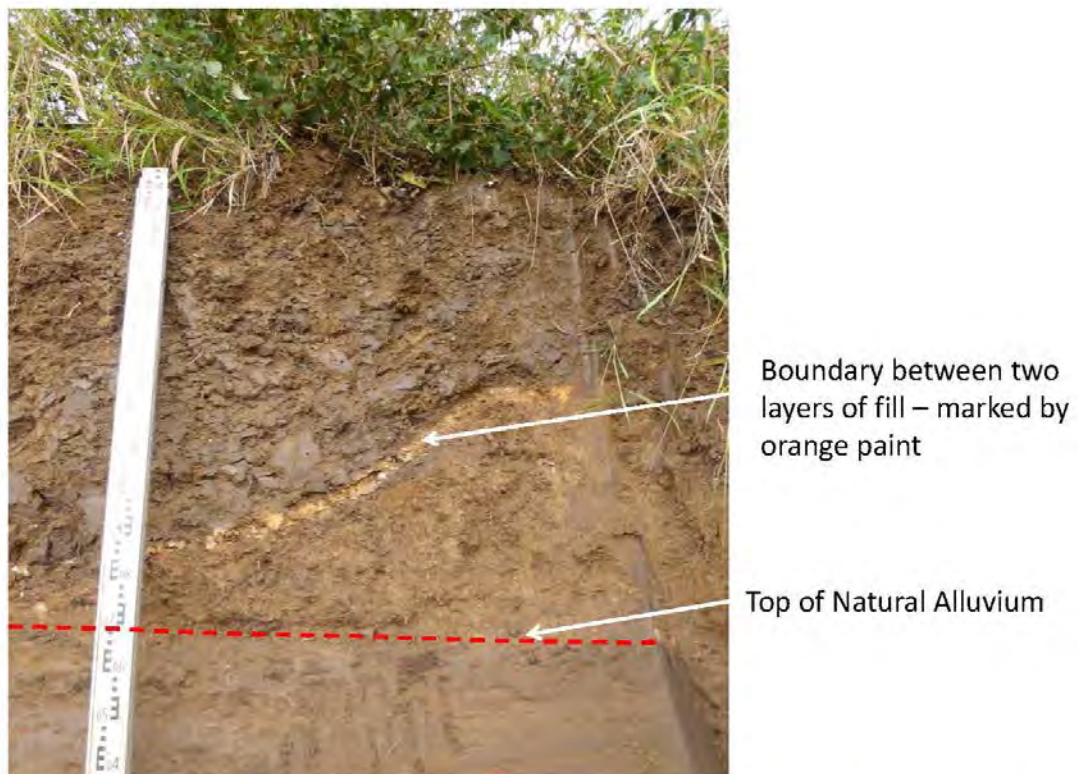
Test Pit 113 – Western side of access track – viewed towards south – face excavated in remnant bund
